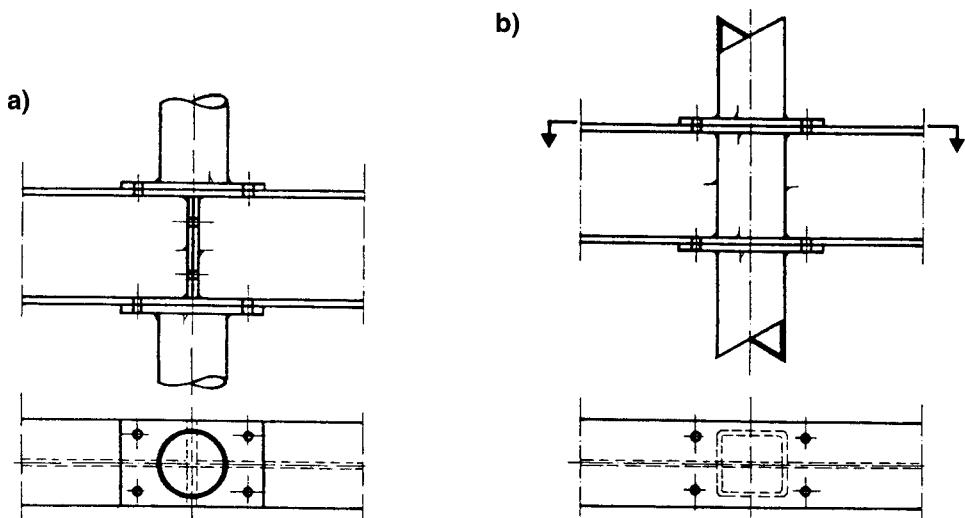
Beam-to-column connection with continuous beam extending on both sides of column in
